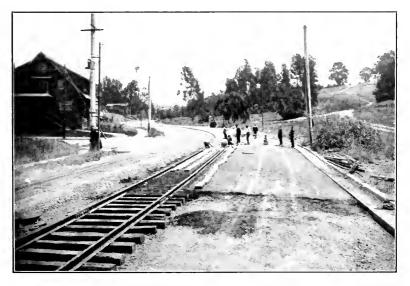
Asphalt Paving, Fourth Avenue, Oakland, Cal. Vitrified Brick Liners. Asphaltic Concrete Between Ties, Instead of Hydraulic Concrete.
